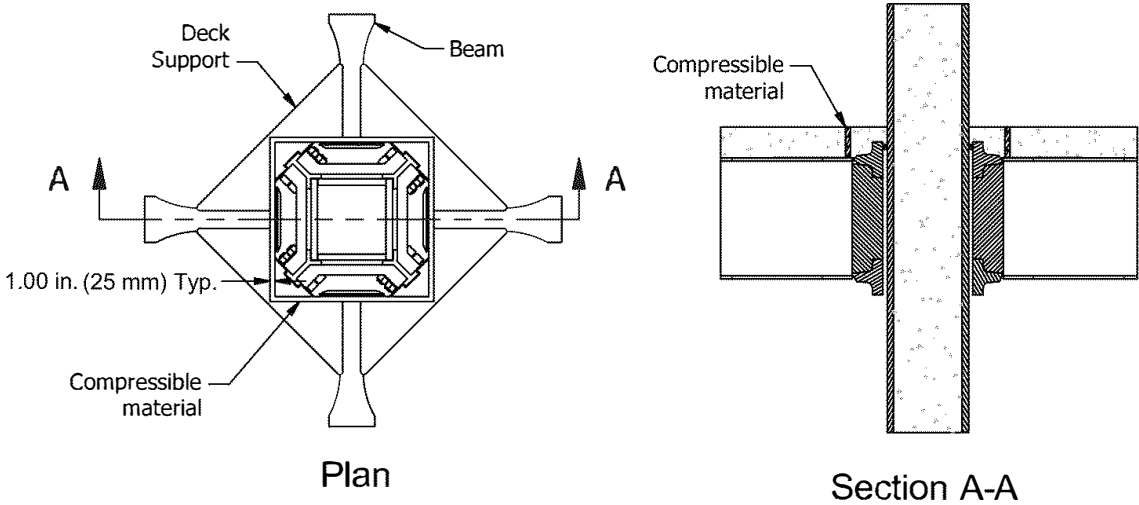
Use of compressible material to isolate structural slab from connection.
